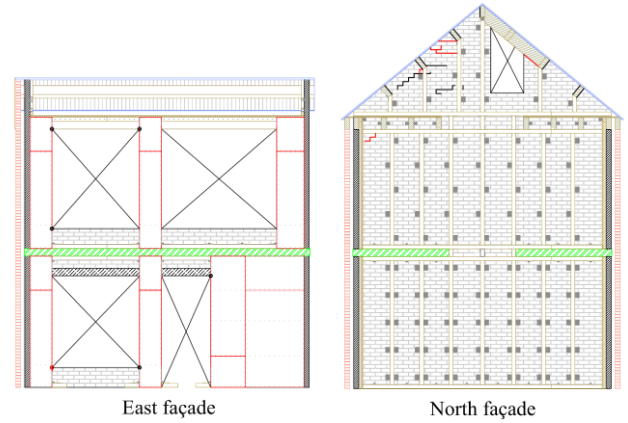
Retrofitted building crack pattern after EQ-NPR-100%: CS inner leaves transverse walls.
